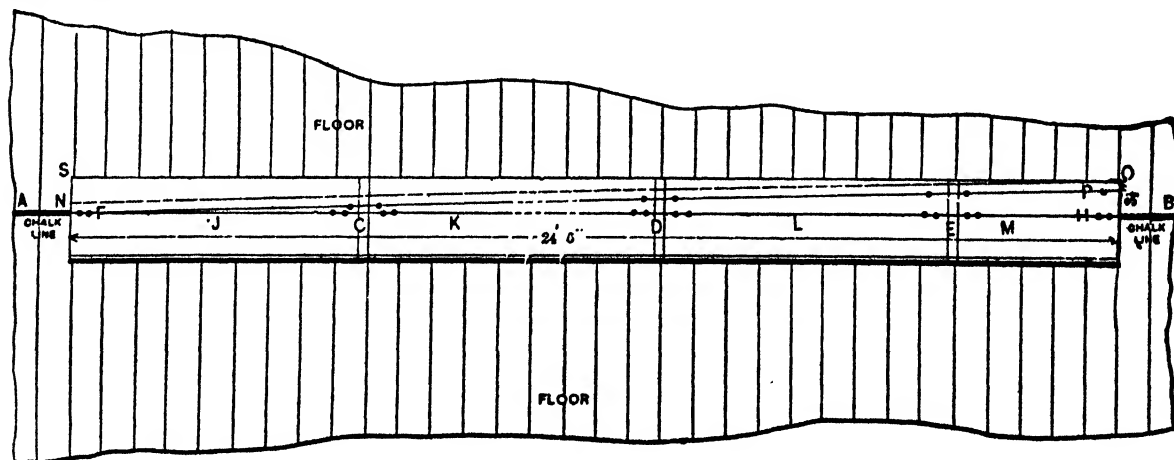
Method of Laying Out Gutter on the Floor to Obtain Pitch
